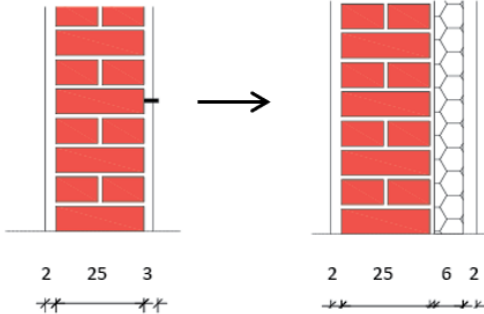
Possible interventions in the façade with traditional brick walls, by adding a layer of thermal insulation.
